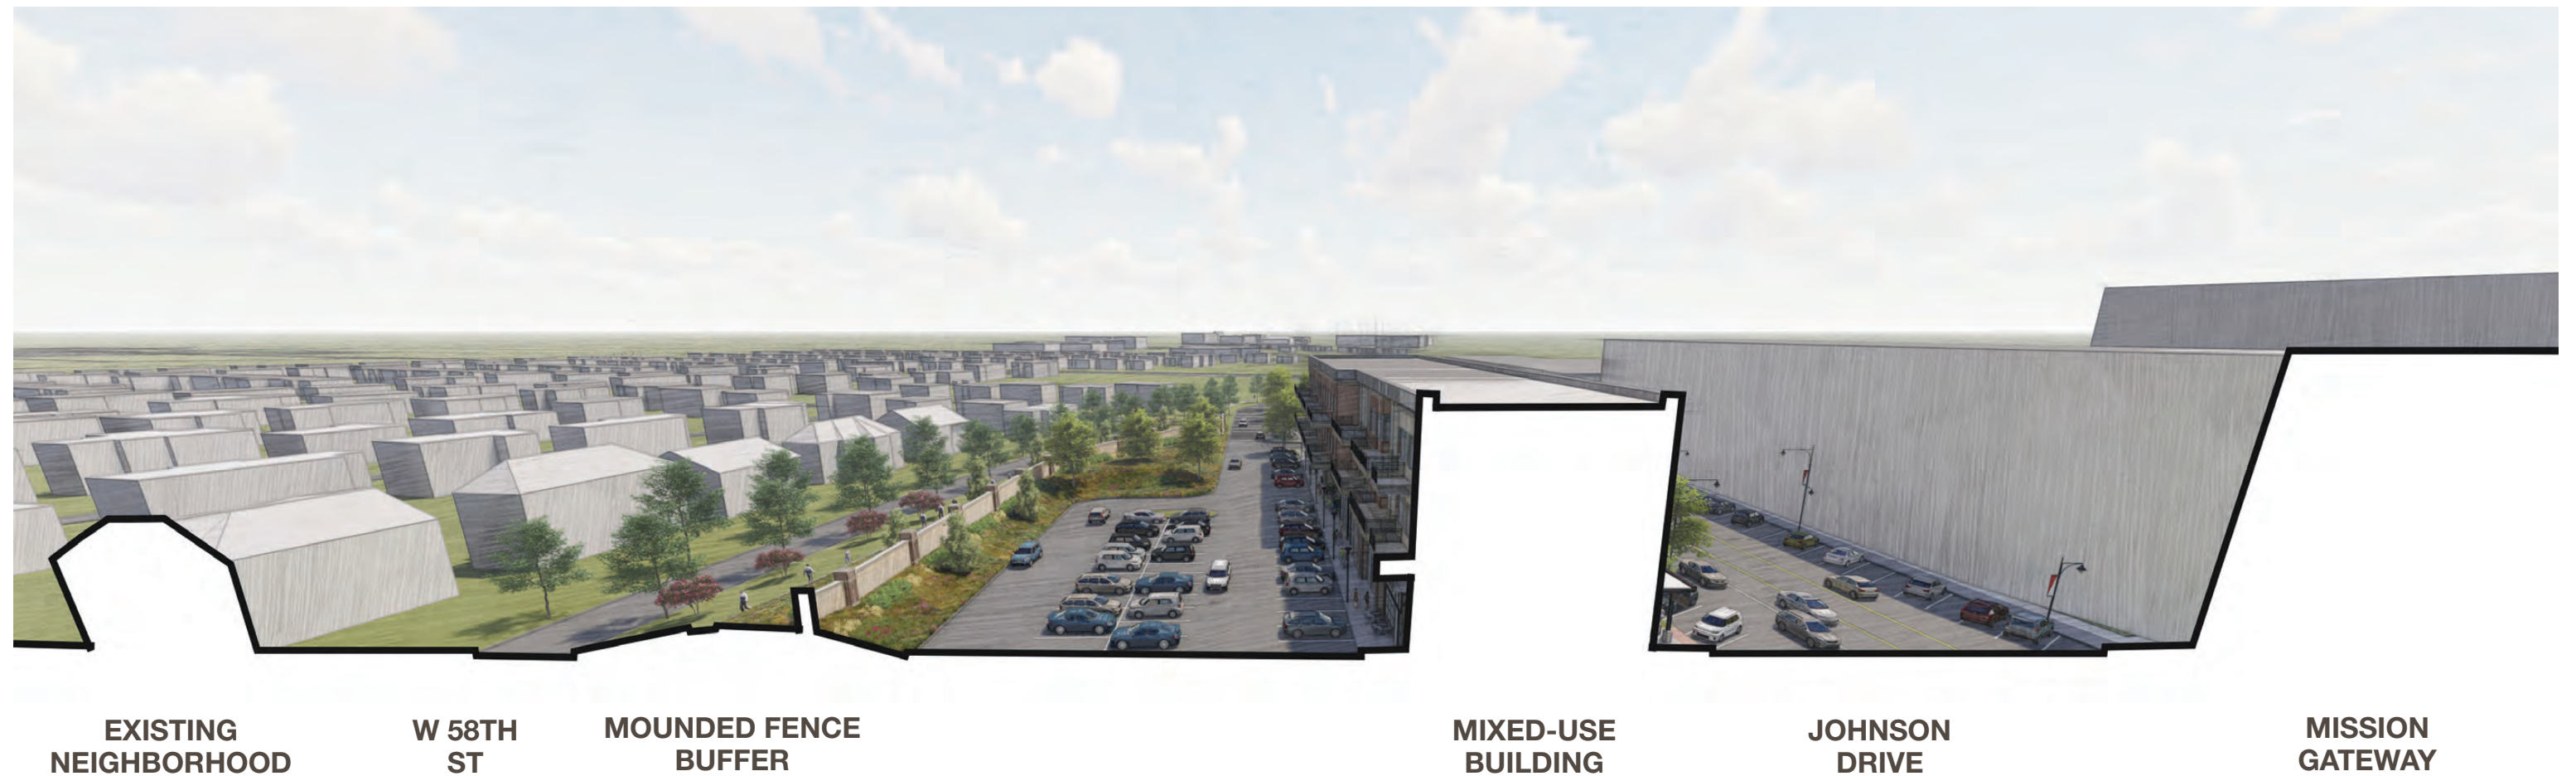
Site Section - Neighborhood through Buffer to Mission Gateway
